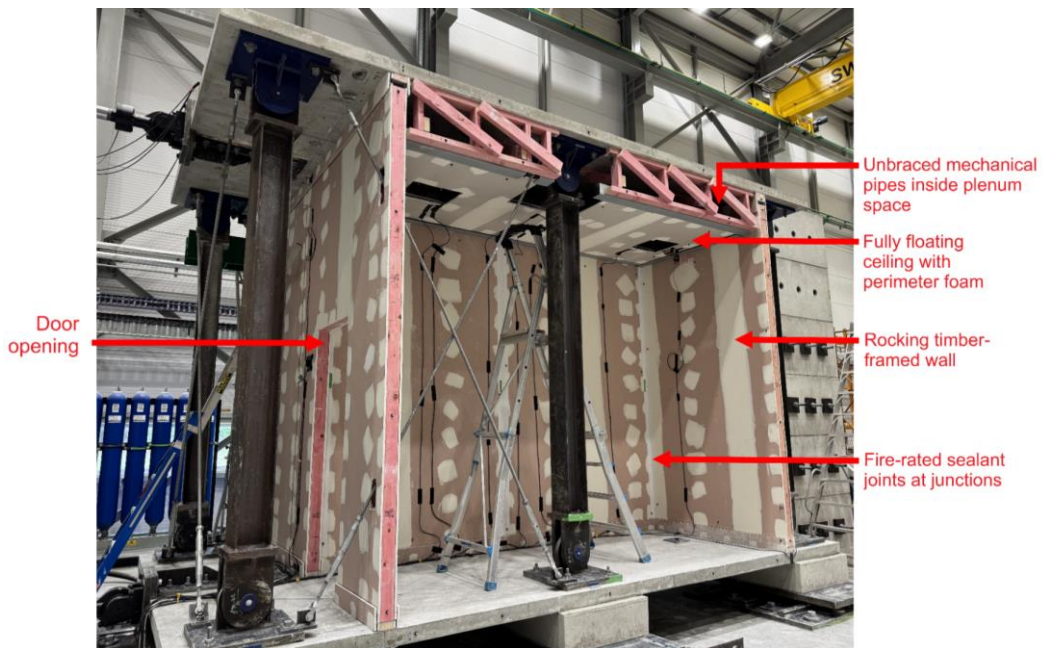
Photo of constructed specimen (Southeast elevation)
